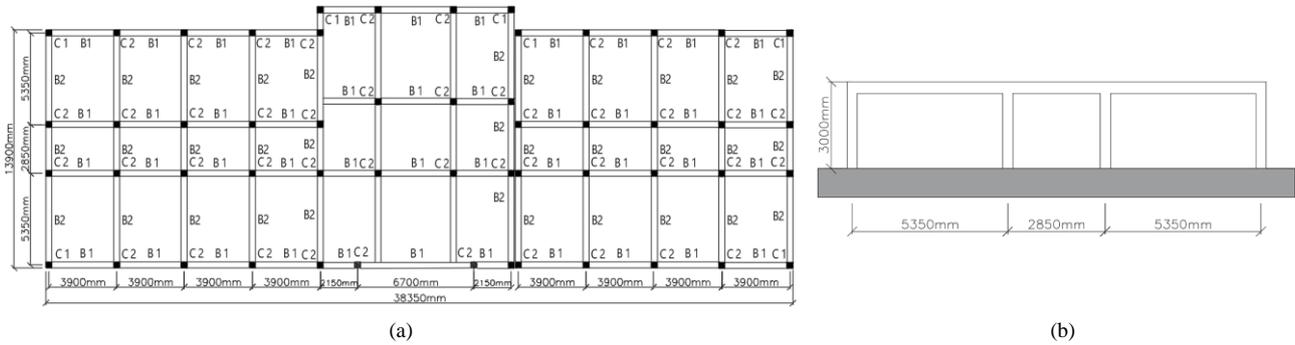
B-type single-story RC structure (a) first-floor plan, (b) RC frame (transverse direction)
